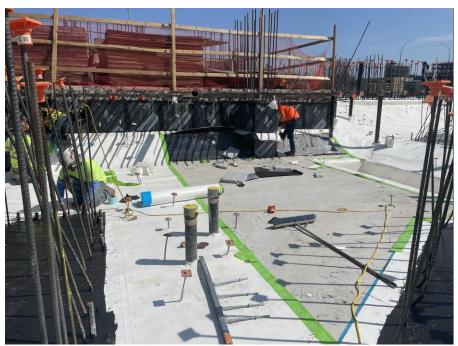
Kingdom installing the waterproofing/vapor barrier membrane in the northern part of Sackett Place (facing northeast)
